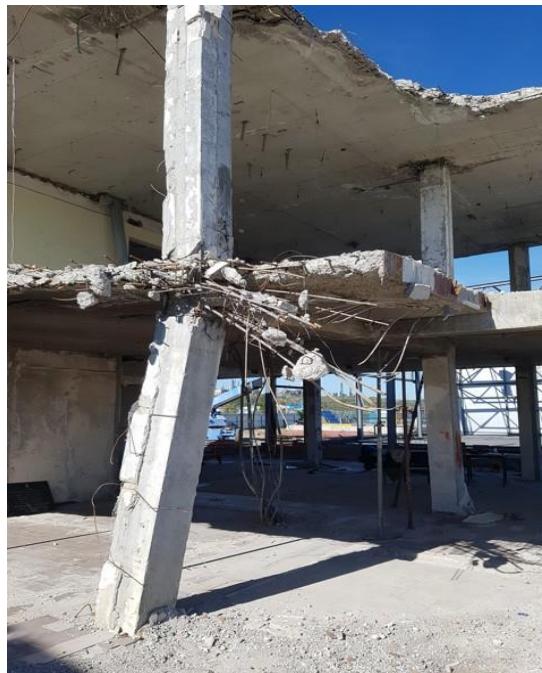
, 5). Significant concrete fractures, baring of steel rebars, and cracks with a width
